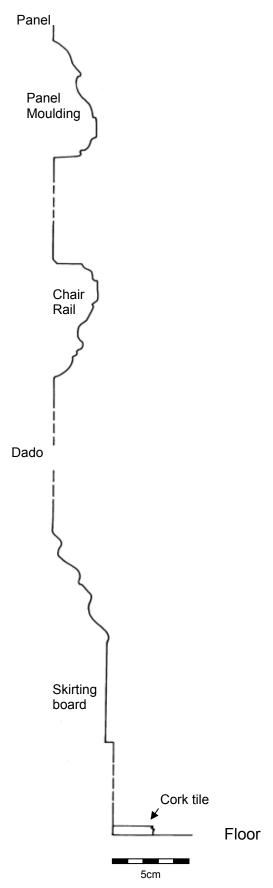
Room 1, skirting board, chair rail and panel moulding on west wall
